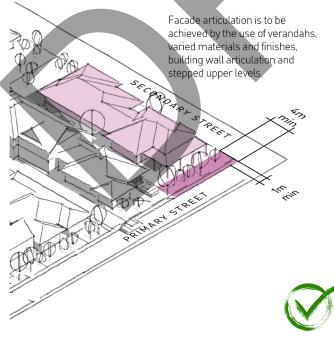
Single House and Grouped Dwellings - Street Setback Example Diagram
